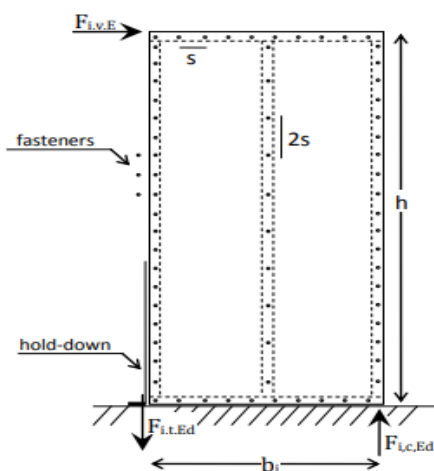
Timber-frame shear-wall panel with fastener spacing (Hoekstra, 2012)
